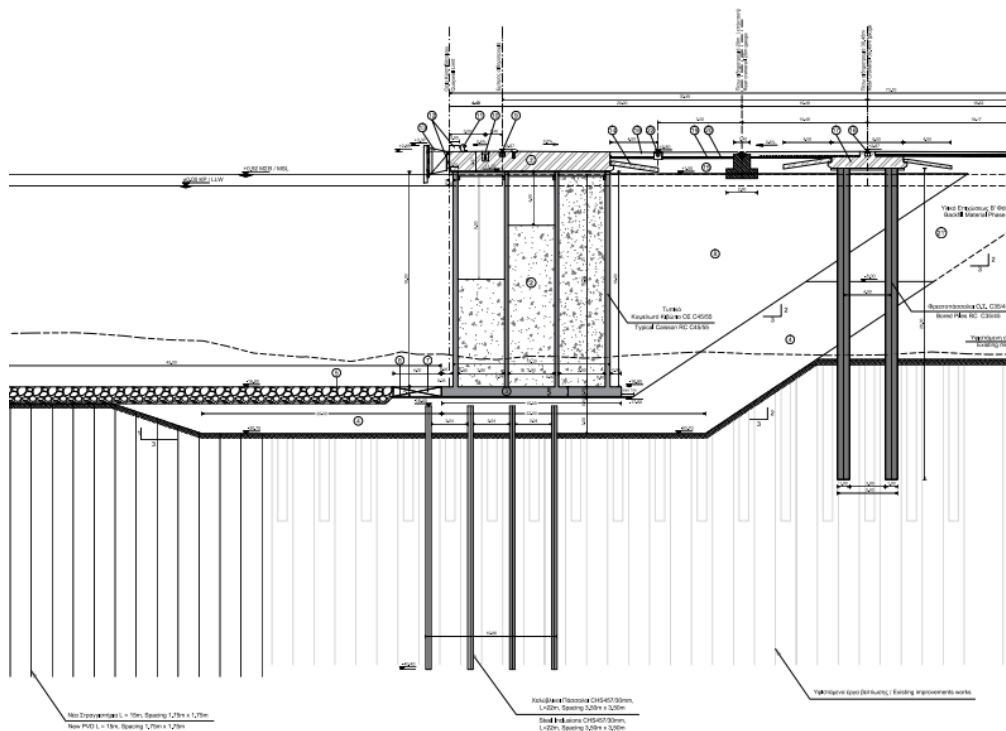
Typical Cross-section of the quay wall according to the approved Design
